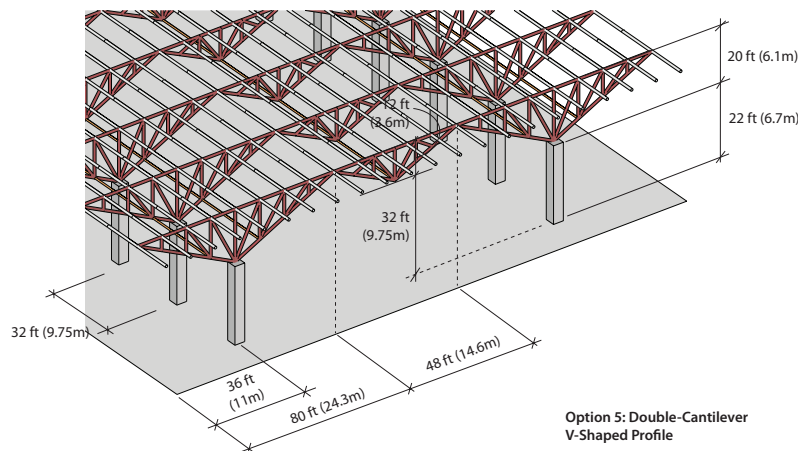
Option #5, double-cantilever V-shaped truss scheme
